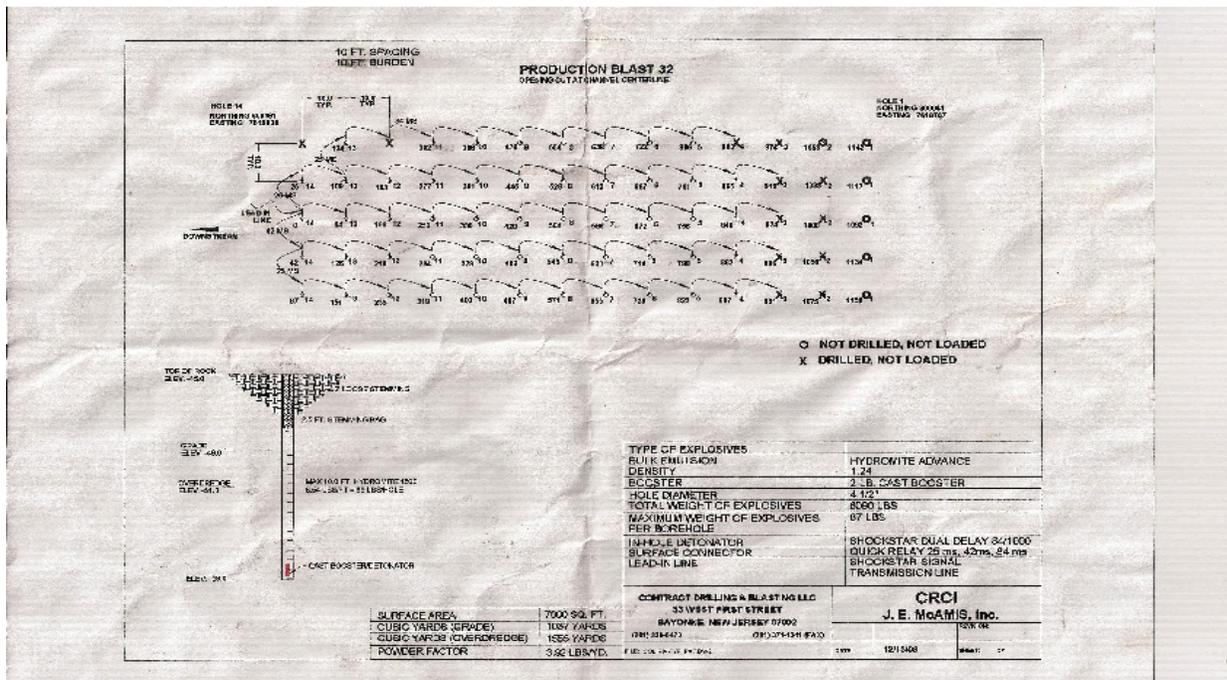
An Example of a Typical Production Blast Plan Report. These reports contained blast details specific to each blast.
